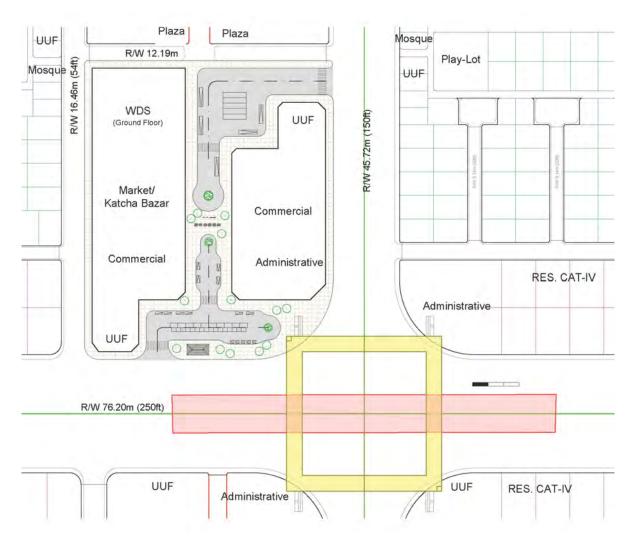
Proposed Station Plaza at Purbachal Central Station (Alternative 2)
